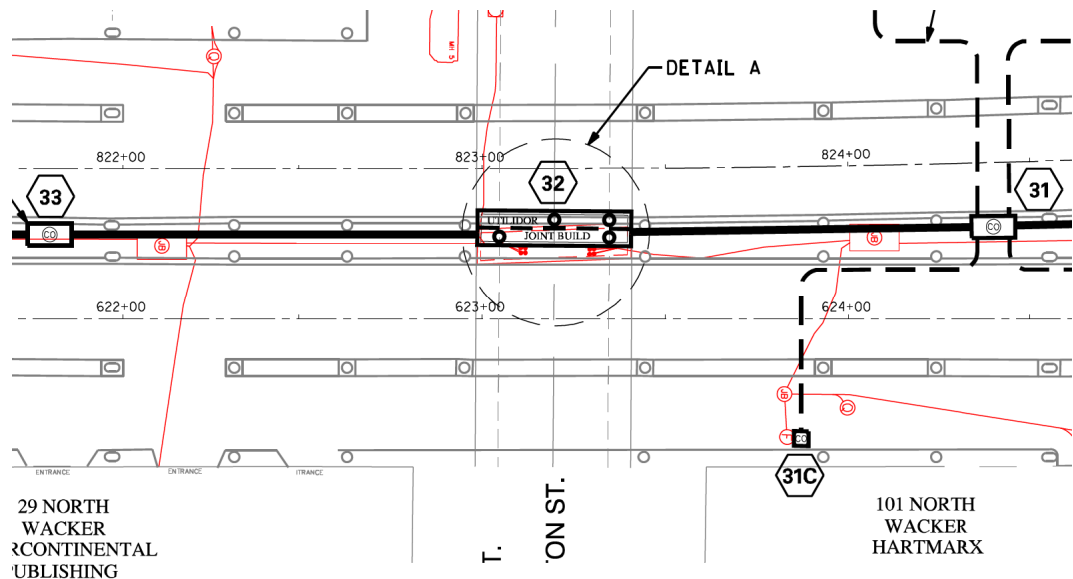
Associated Washington Blvd. Trolley Tunnel Manholes
